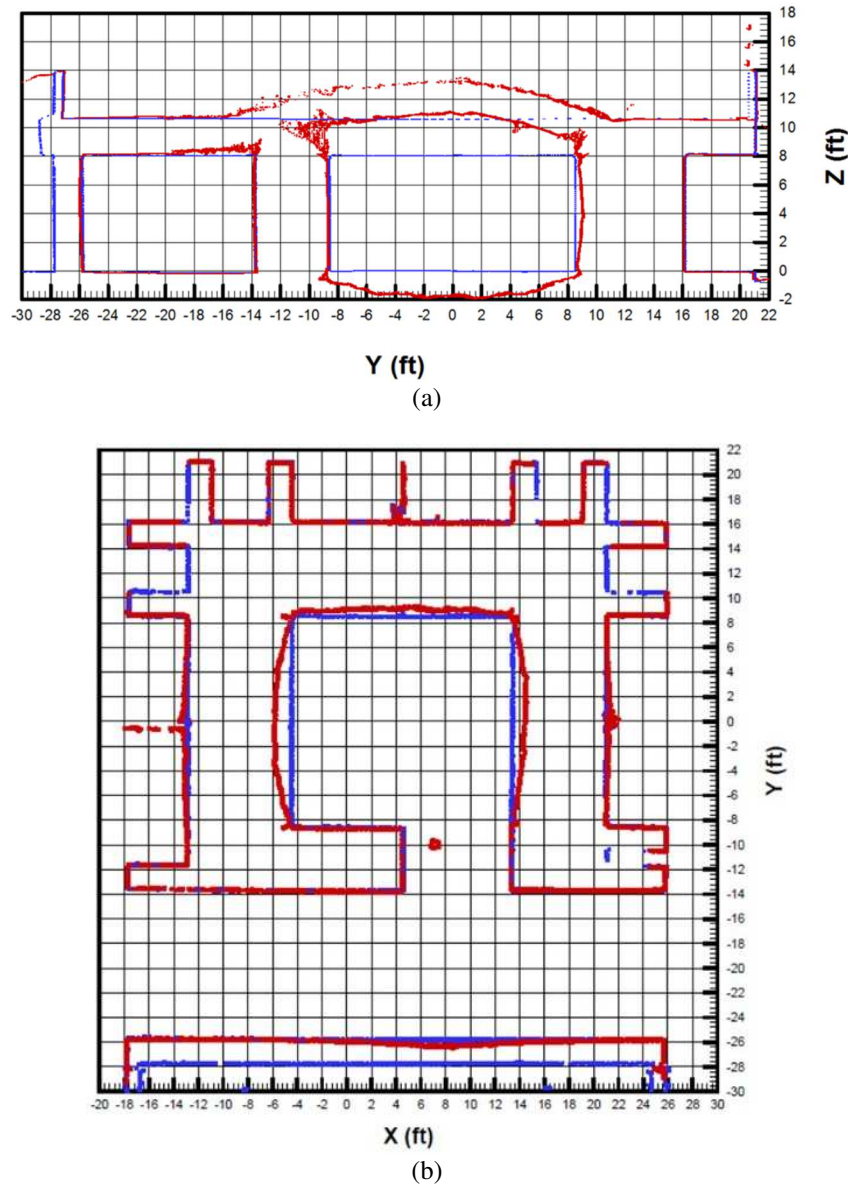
LIDAR survey data showing (a) elevation and (b) plan view of the deformation of test structure [8]
